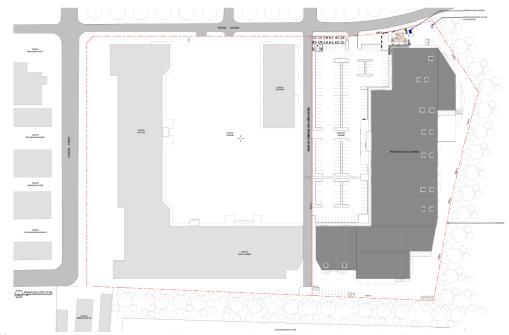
Access and car parking connections - subject site and 26 Boeing Avenue.
